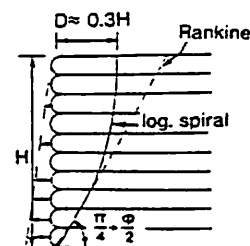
Log-spiral failure plane and wall face displacement typically observed in a R. E. retaining wall (modified from Fig. 4 of Schlosser and Juran, 1980)
